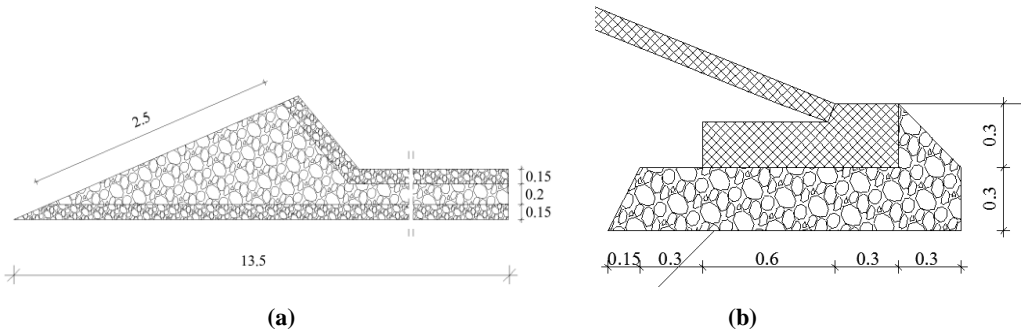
Structural details of the dam cross section – filter (a), basement of the concrete face (b)
